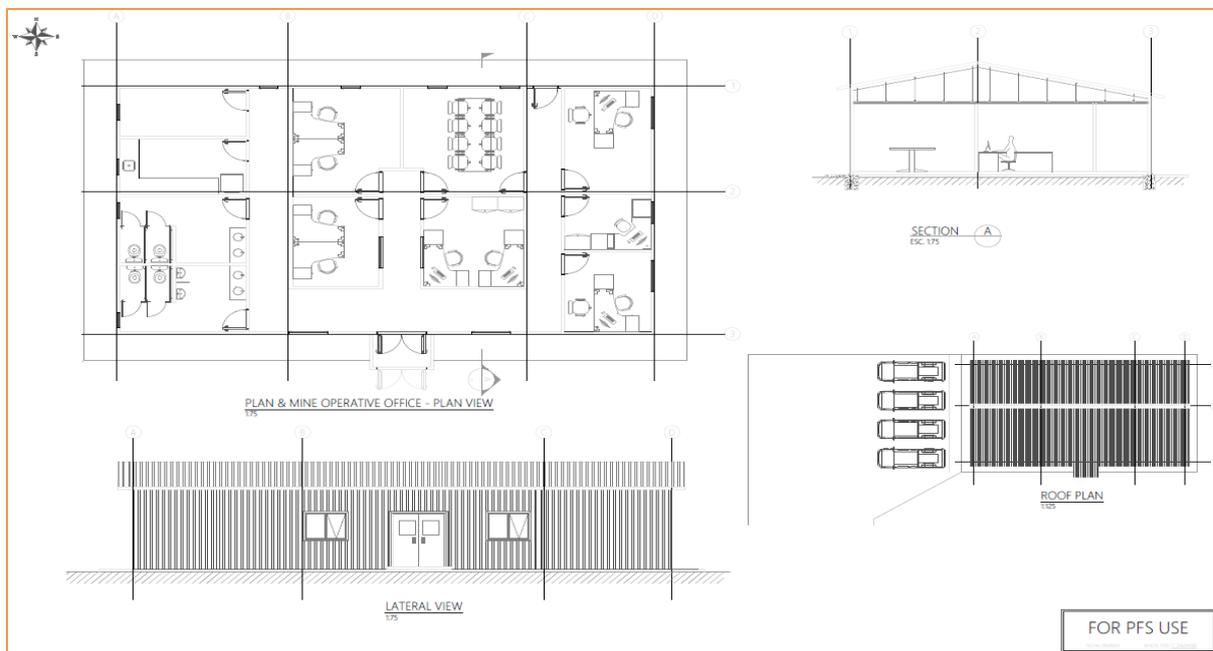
Typical Lay-Out of Work Front Offices for Mine and Process Plant Staff
